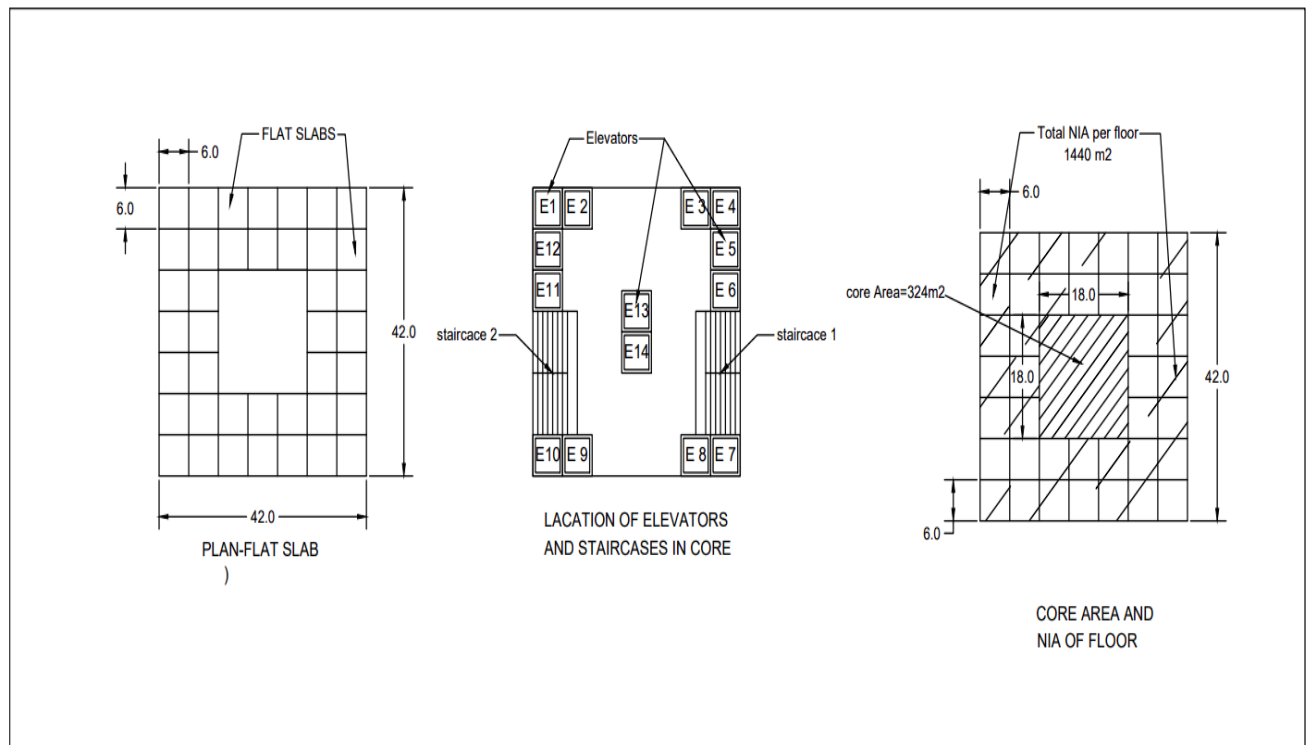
Floor plan , location of elevators, core area and net internal area for flat slab
